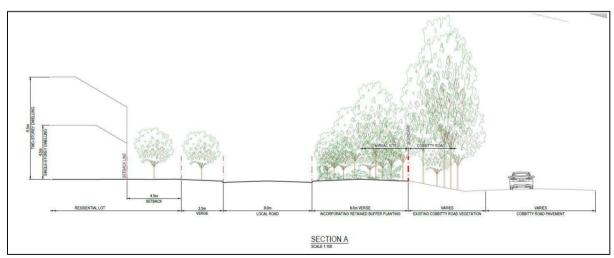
Cross Section of Cobbitty Road (existing Figure 28 in DCP)
